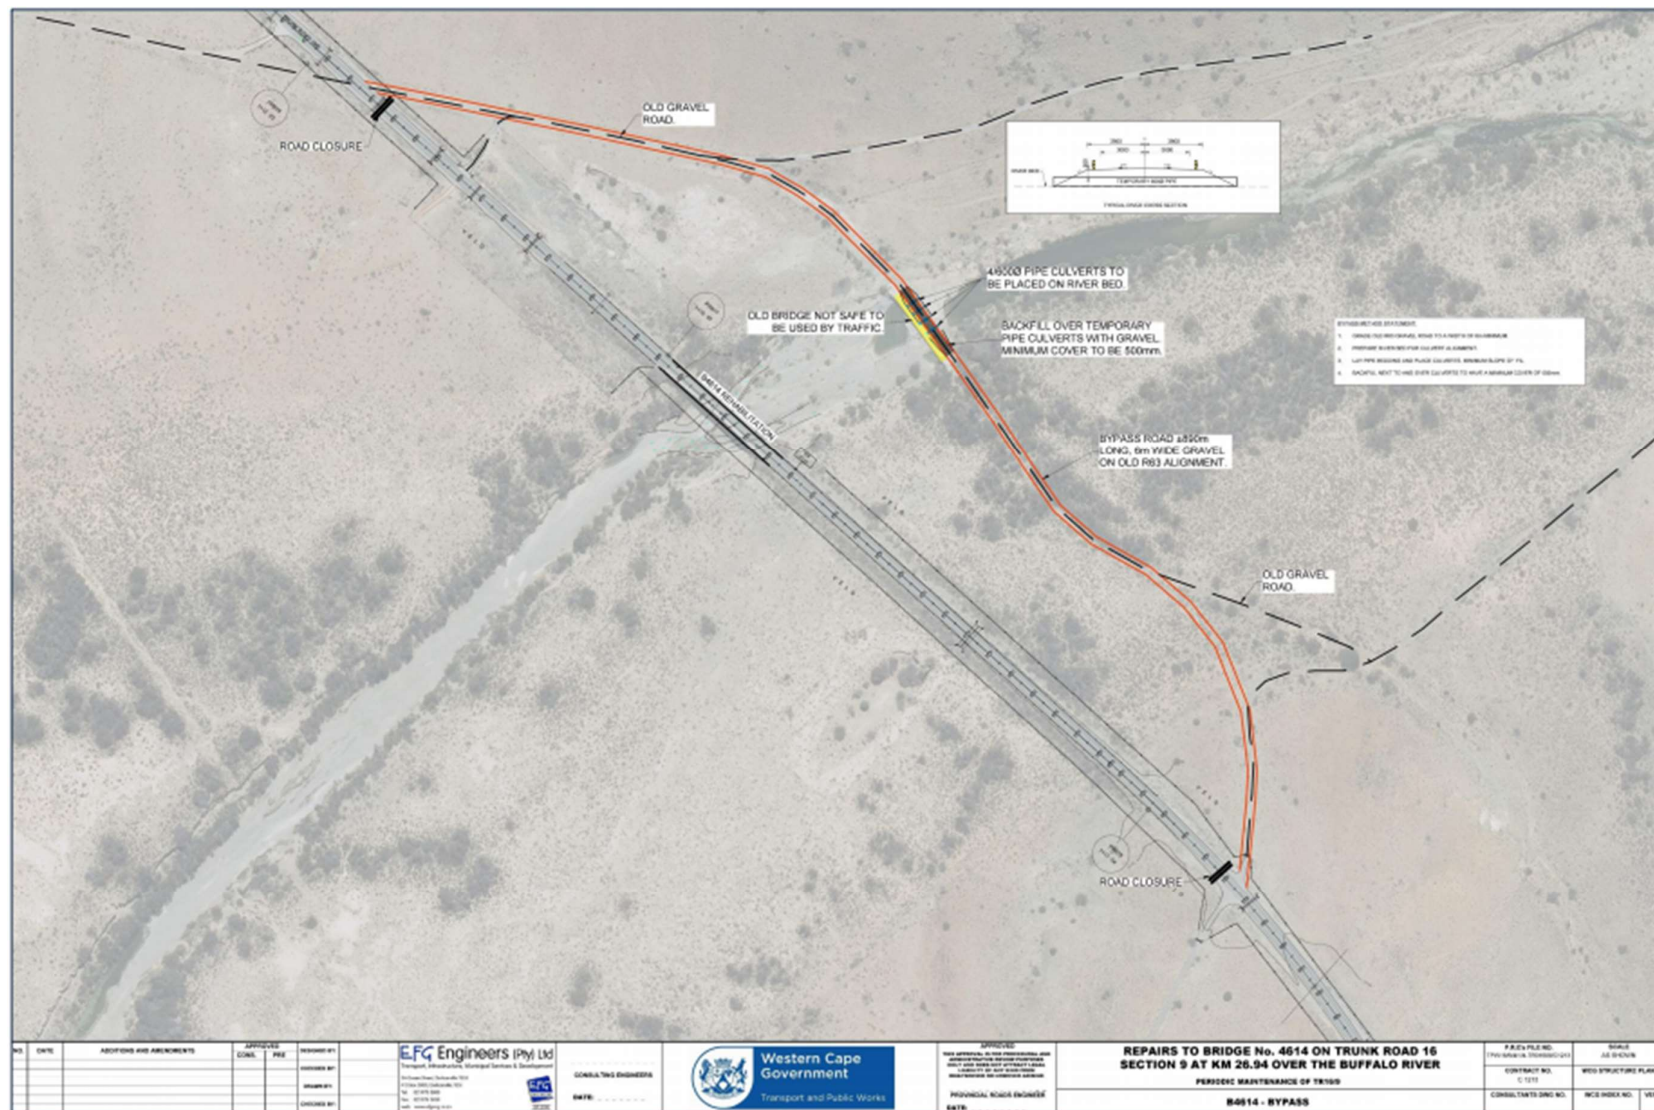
TEMPORARY BYPASS LAYOUT PLAN
